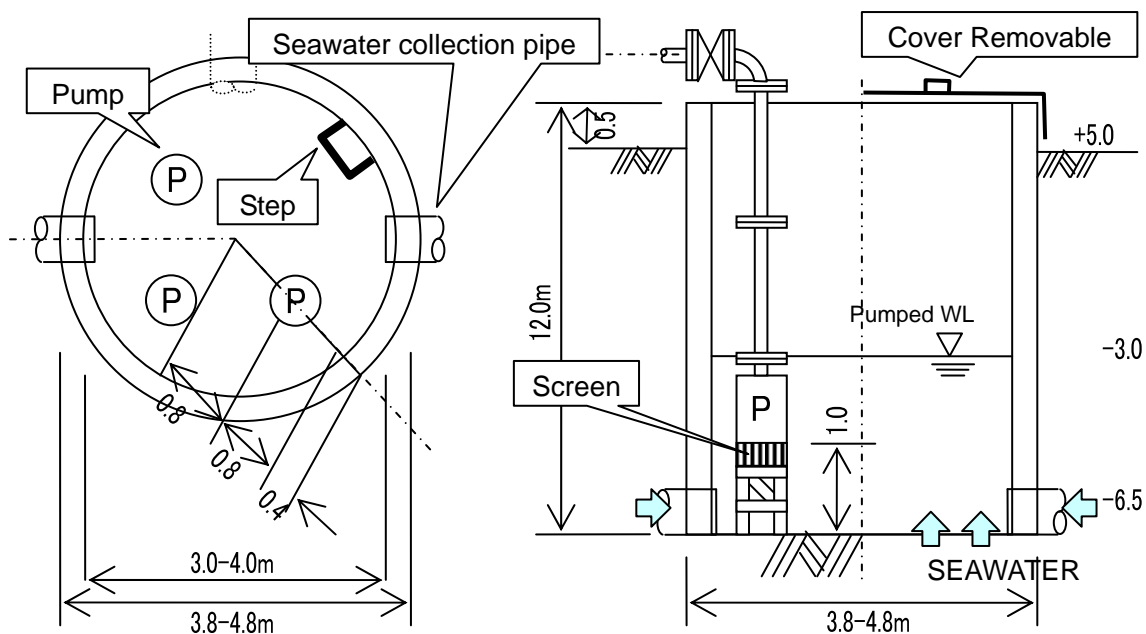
Schematic Plan of Seawater Intake Well
